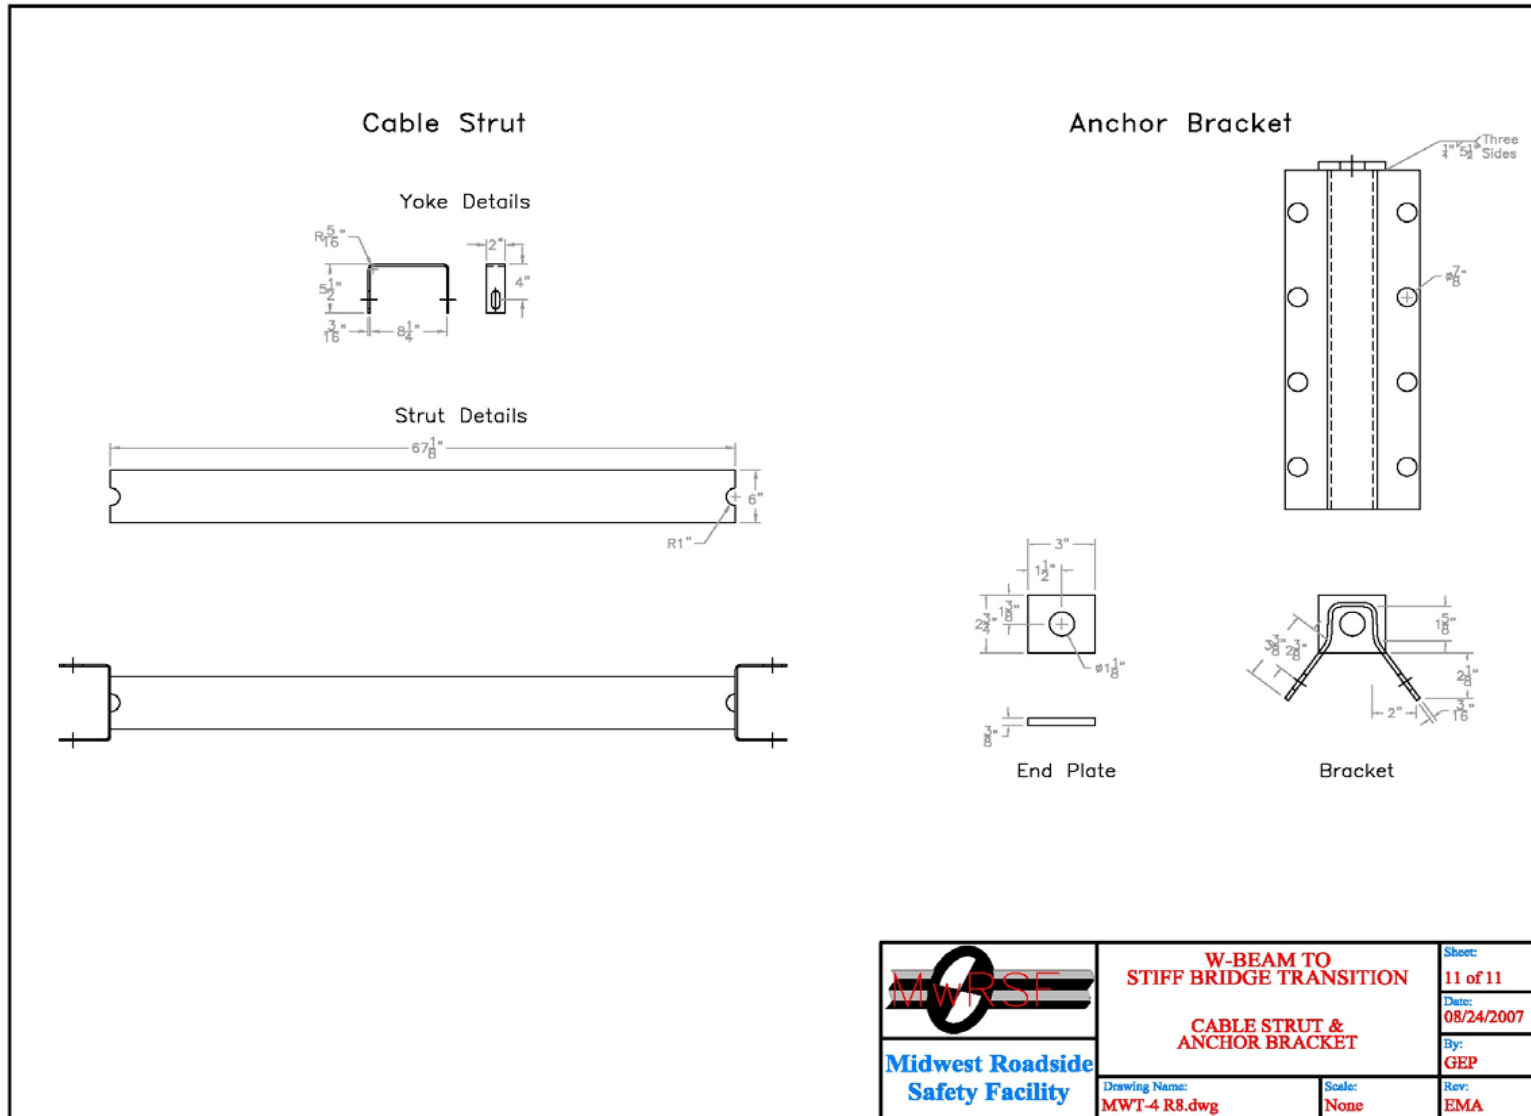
Cable Strut and Anchor Bracket Details, Design No. 2 (English)
